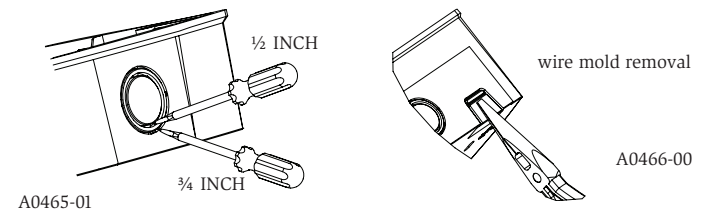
KNOCKOUT REMOVAL FOR SURFACE MOUNT BACK BOX
